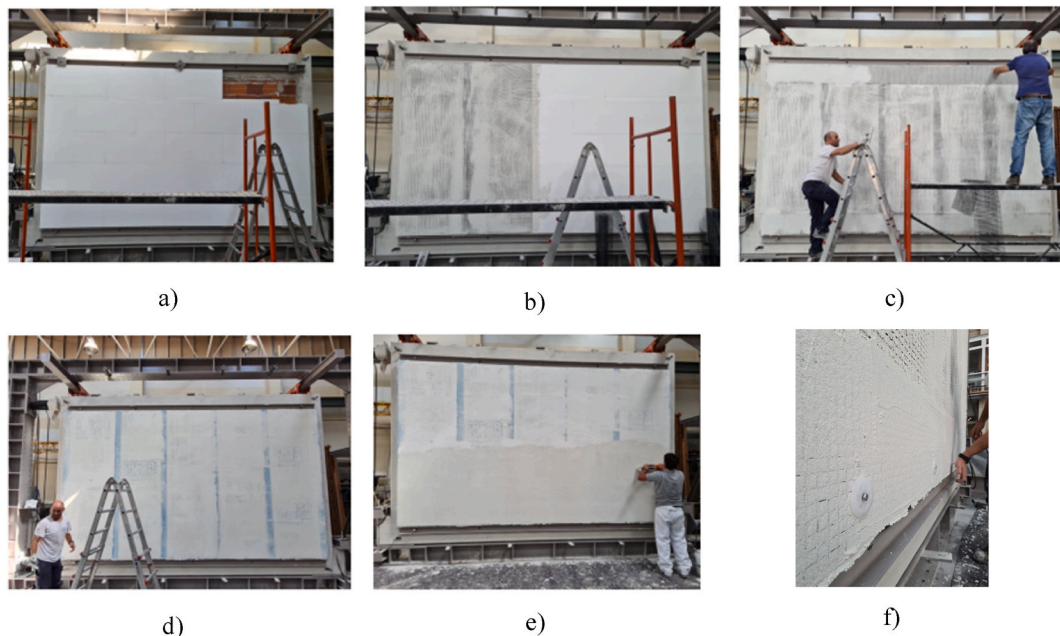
Retrofitting process of specimen ES_1: a) positioning of the EPS plates; b) application of the reinforcing mesh (vertical strips) and c) horizontal strips in the top and bottom interfaces; d) application of nonstructural mesh; e) application of last layer of adhesive mortar; f) detail of the connectors used to fix the retrofitting material to the RC frame.
